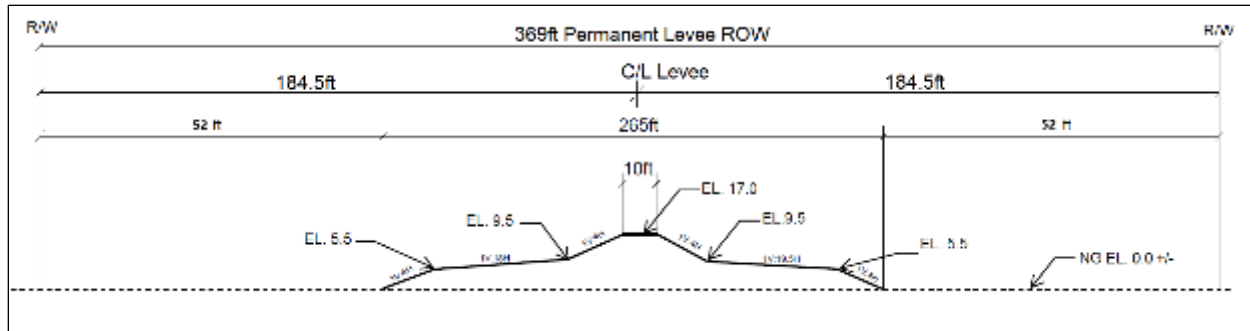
Typical Levee Section for 2085 Design Elevation
